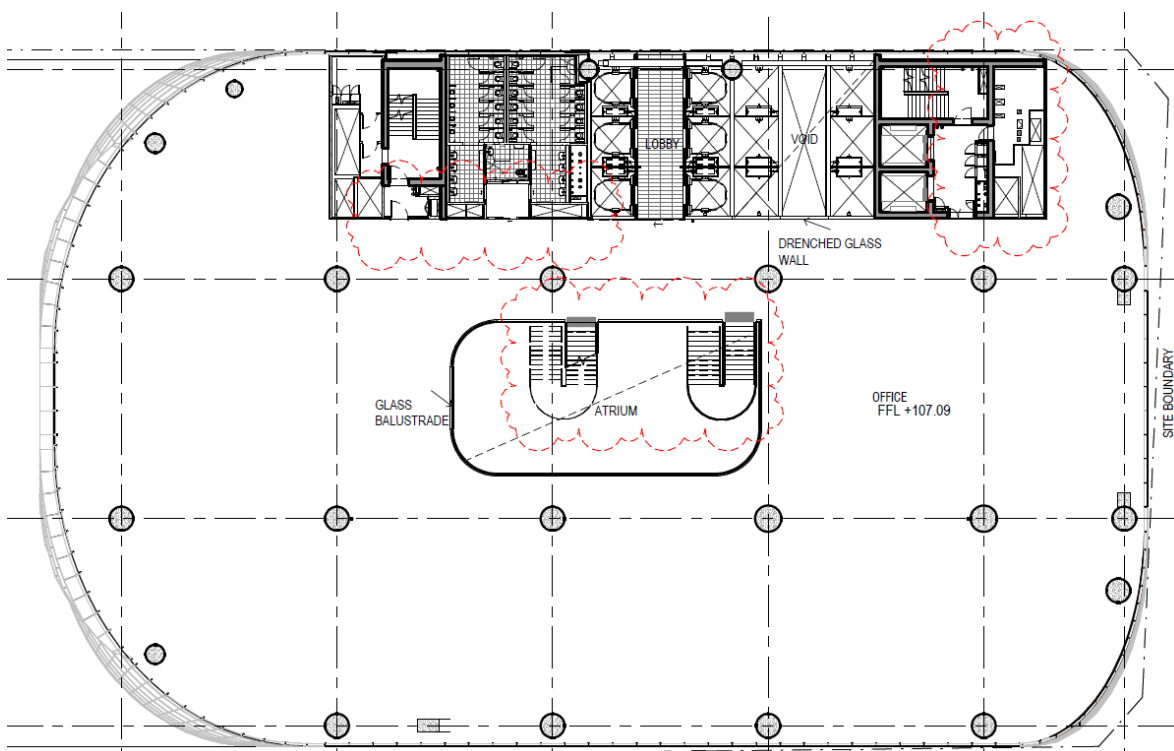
Proposed Level 20 plan showing relocation of inter-tenancy stairs and minor adjustment of atrium
